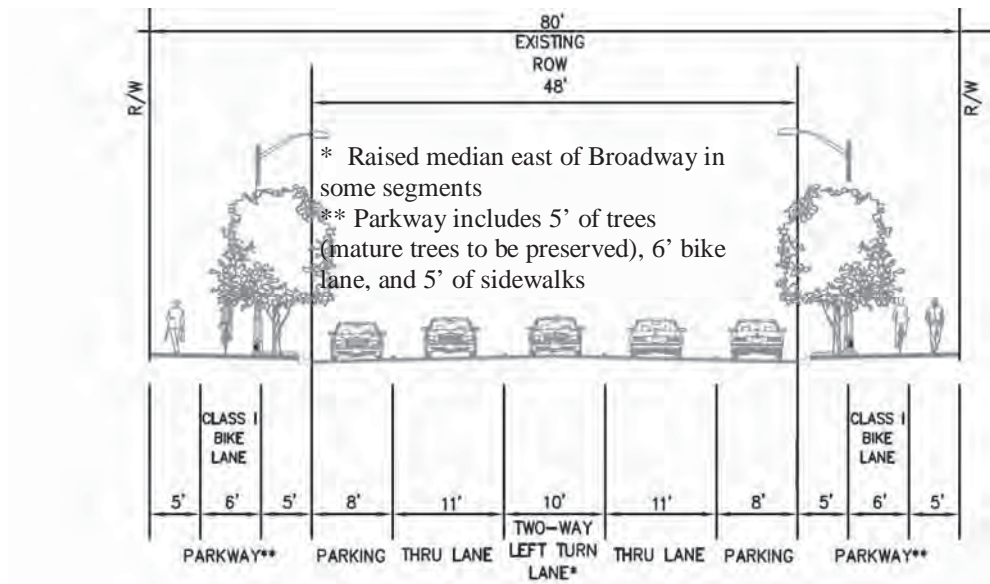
Proposed Cross Section, F Street Between Third Avenue and I-5
